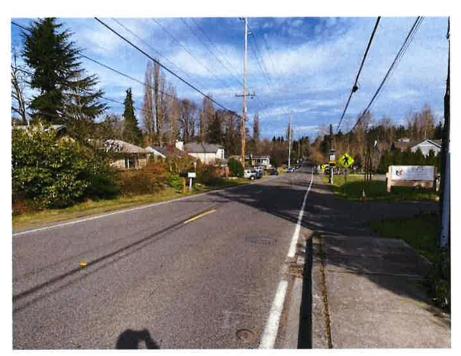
Existing Condition of 1st Avenue NE, Looking North
